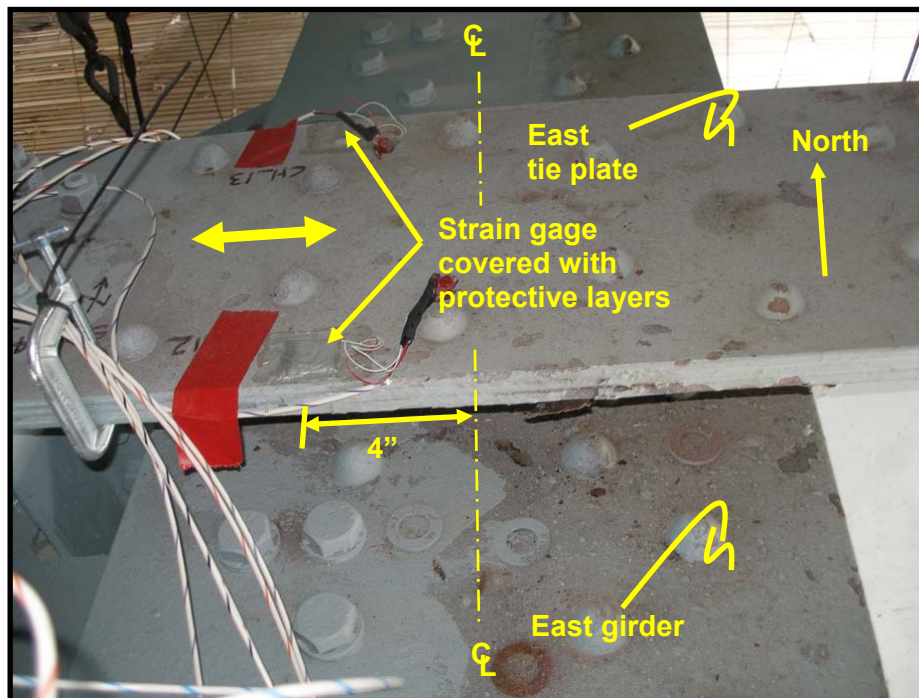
Strain gage CH_12 and CH_13 installed in Span 45 on the east tie plate of Floorbeam 8, which crosses transversely over the east girder at approximately 4 in from the center line of the girder and 1 in from the edge of the tie plate.
